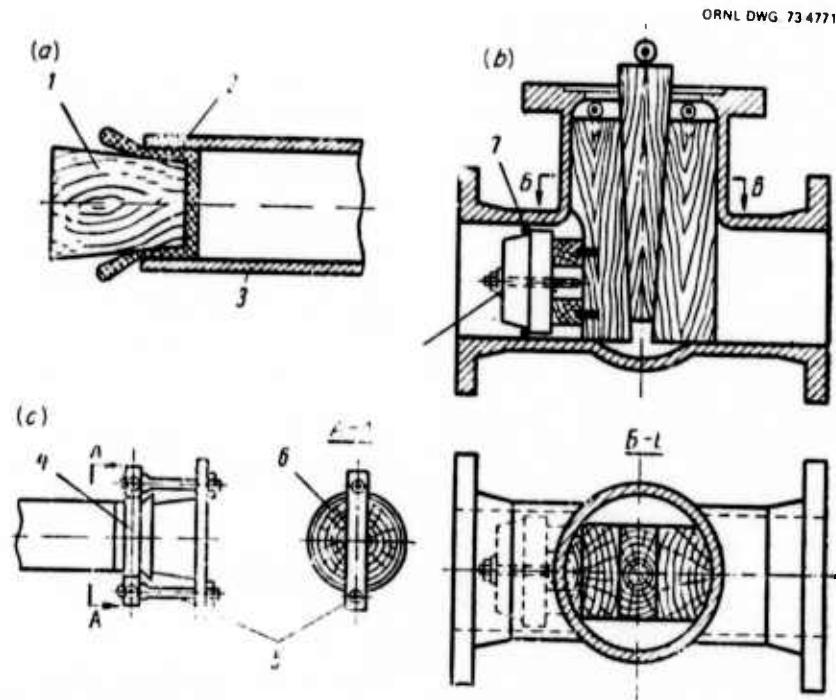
Installing plugs in broken pipes: (a) in a low-pressure pipeline; (b) in a high-pressure pipeline; (c) in a fire plug: 1, wooden plug; 2, burlap; 3, pipe; 4, collar made of iron strap; 5, anchoring bolts; 7, rubber gasket; 8, rubber washer.
